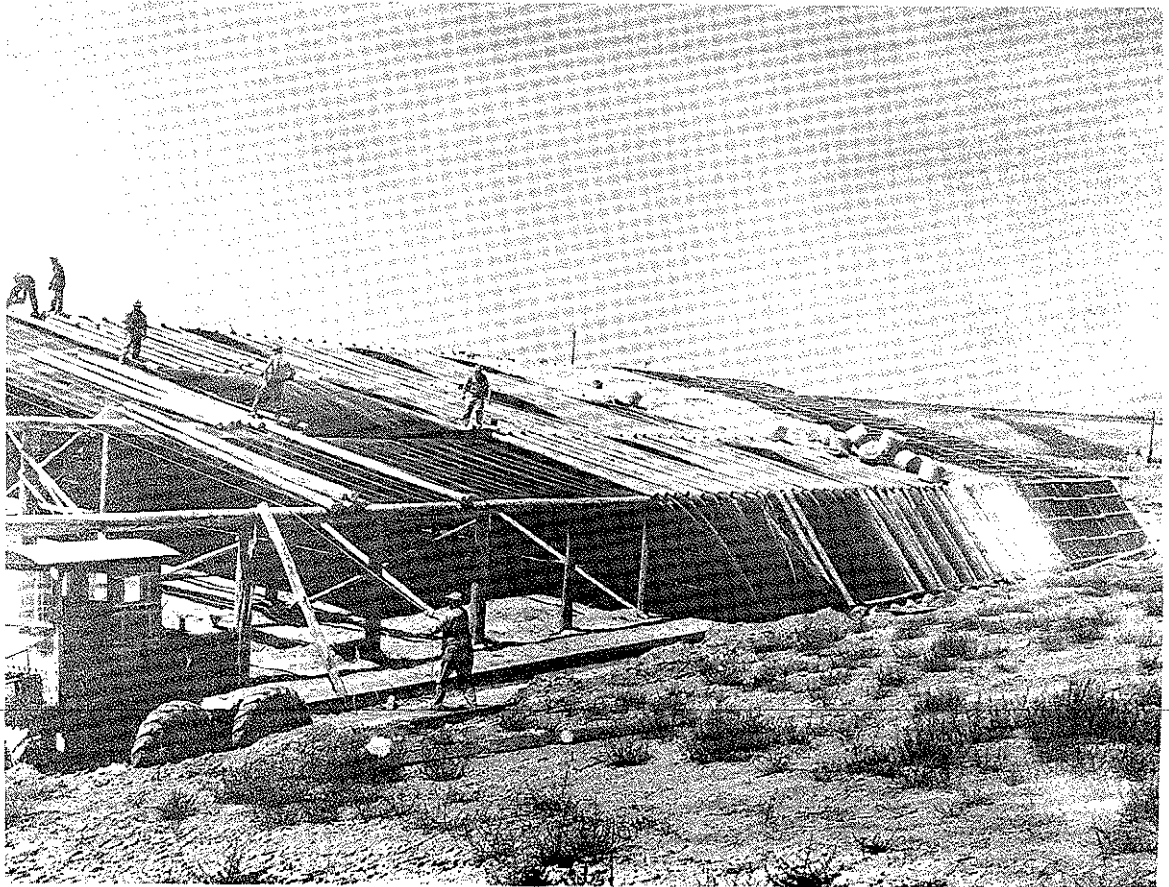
Construction view of Fig. 2 showing insulation bats and second layer of visqueen. Courtesy of U. P. Railroad.
